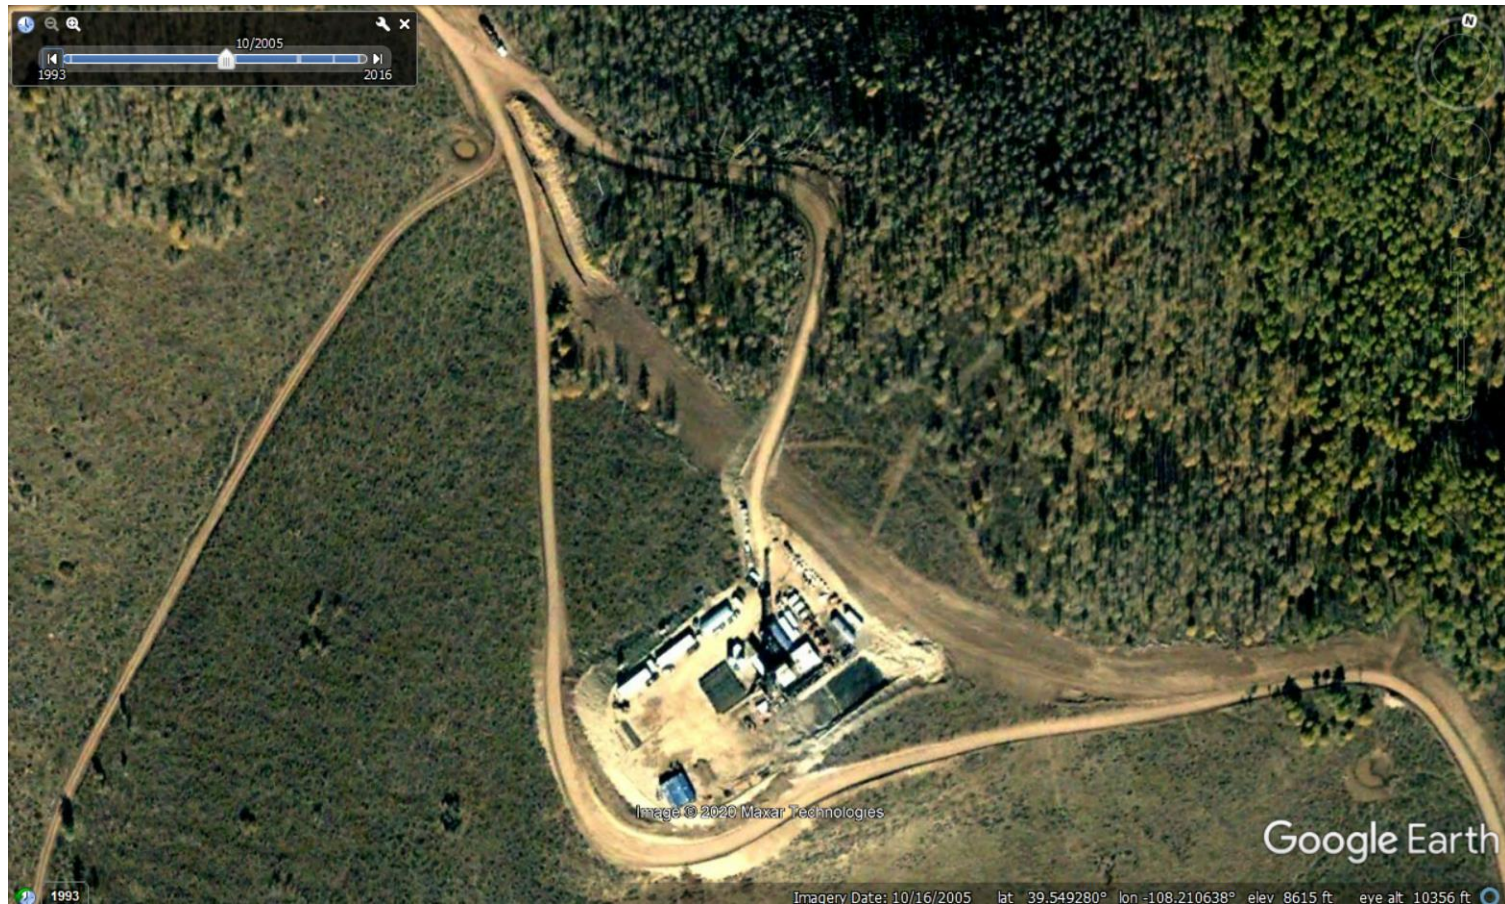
2005 Google Earth aerial imagery. Photo shows rig equipment for drilling operations. Photo also shows an access road was constructed north of the location.
